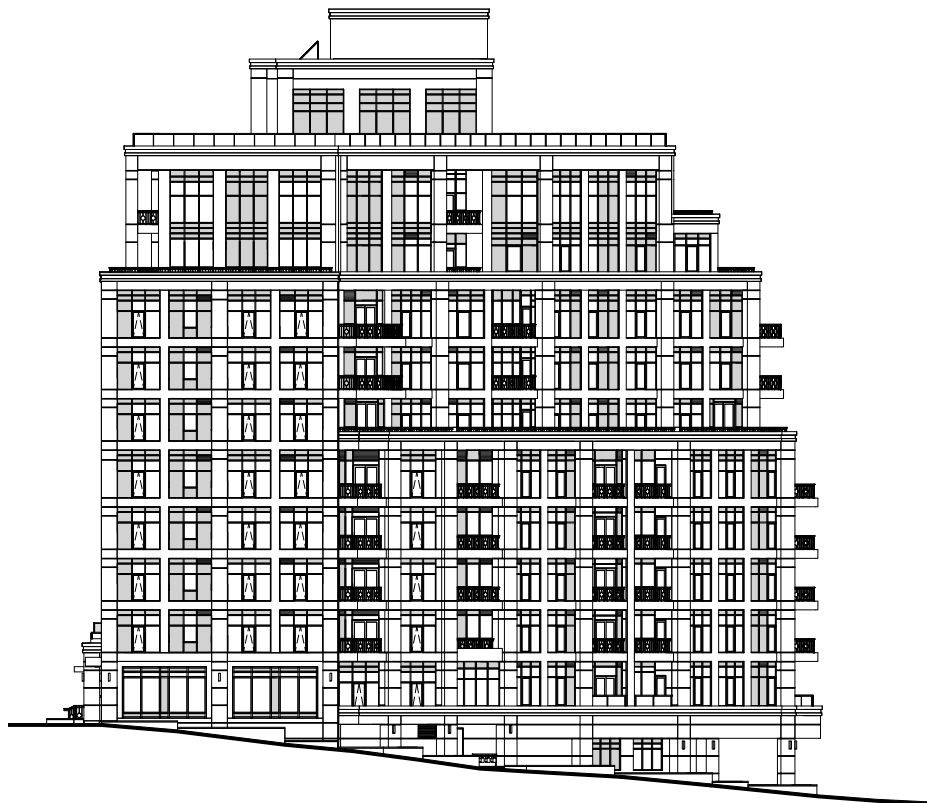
2 Old Mill, Old Mill Elevation (east)
